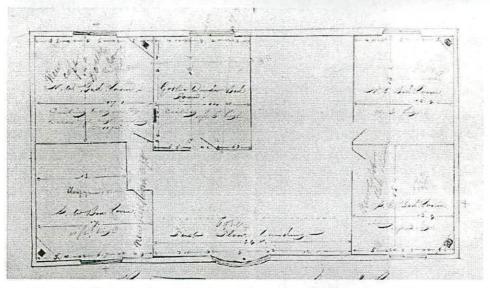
Undated plan of first floor of house, probably late nineteenth century
